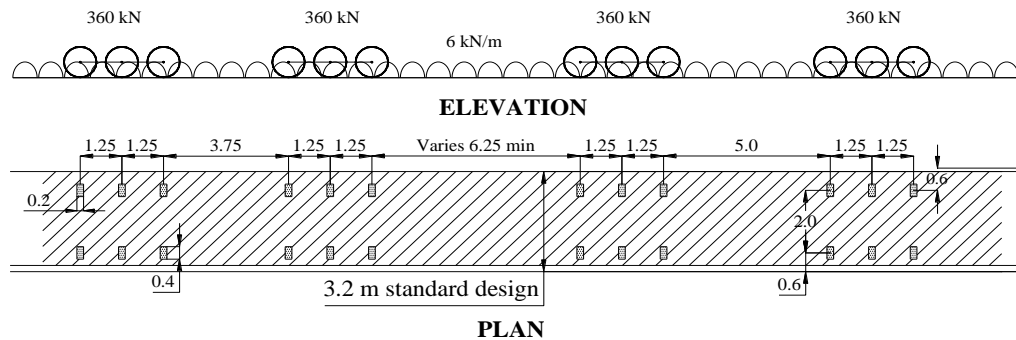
M1600 moving traffic loading plan from AS 5100.2
